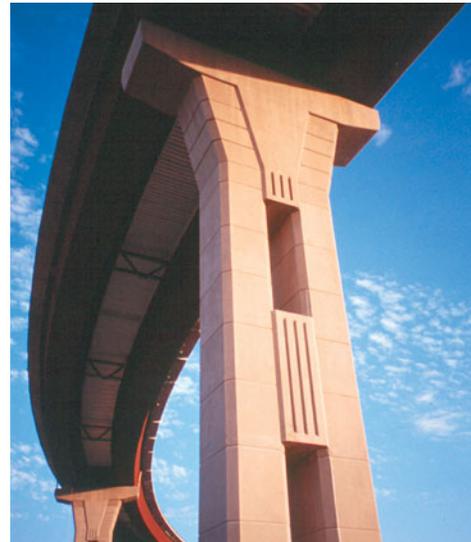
A bold statement in modern highway bridge design, steel tub girders offer advantages in span range, ability to accommodate curvature, and aesthetics.
